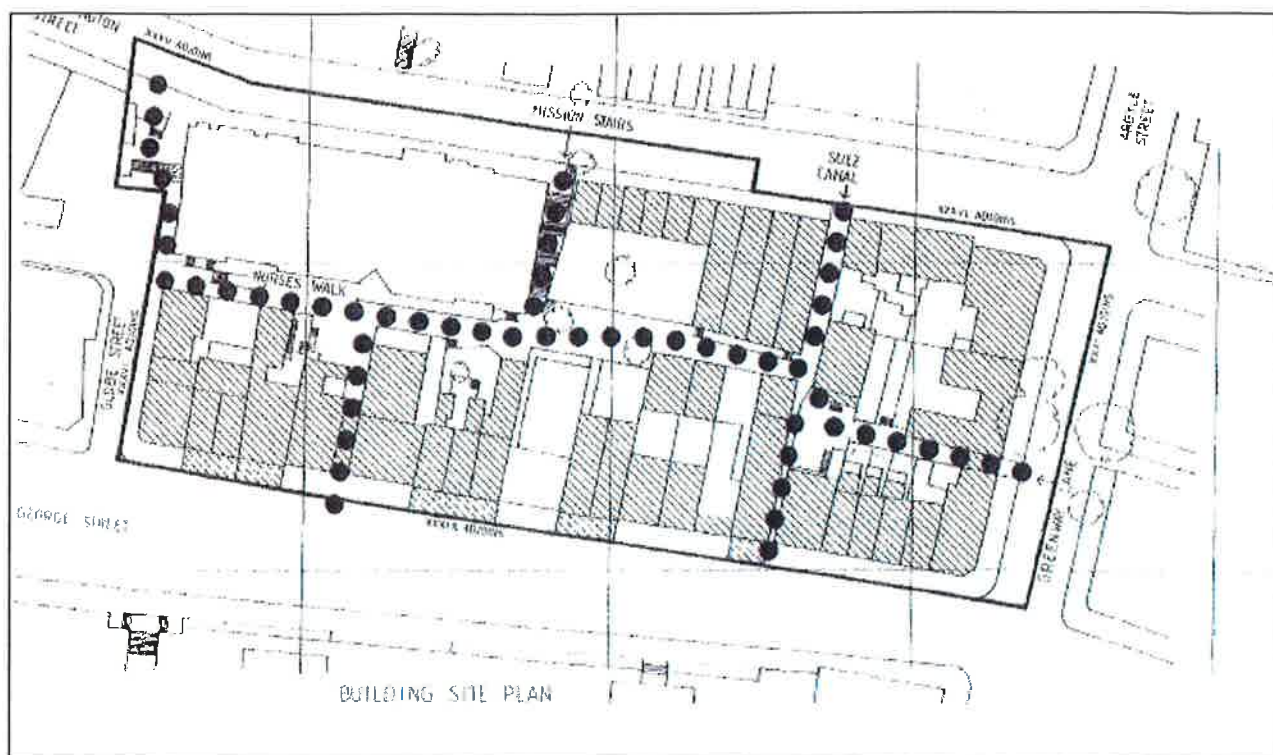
Existing SCRA Scheme Drawing (Source: Applicant's EIS).
